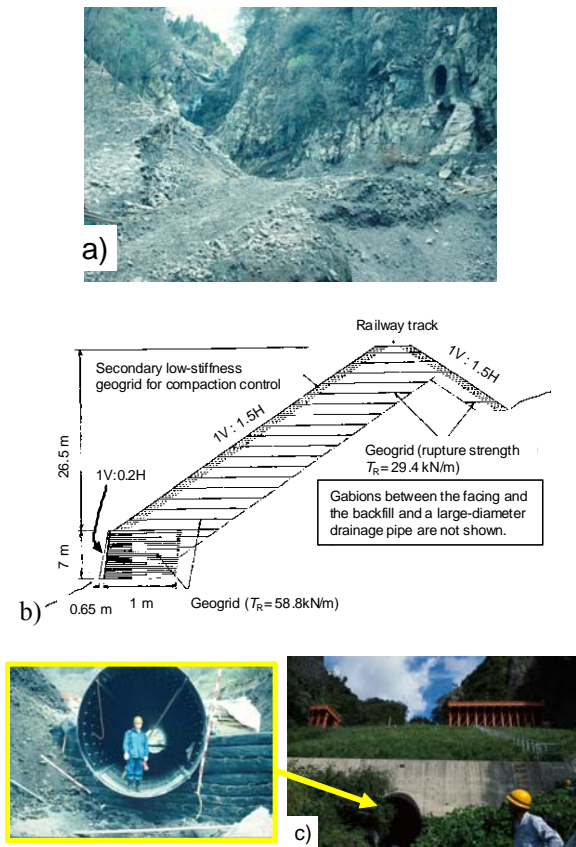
a) Railway embankment damaged by rainfall in 1989, Kyushu; b) reconstructed cross-section; and c) after reconstruction in 1991 (Tatsuoka et al., 1997; 2007).
